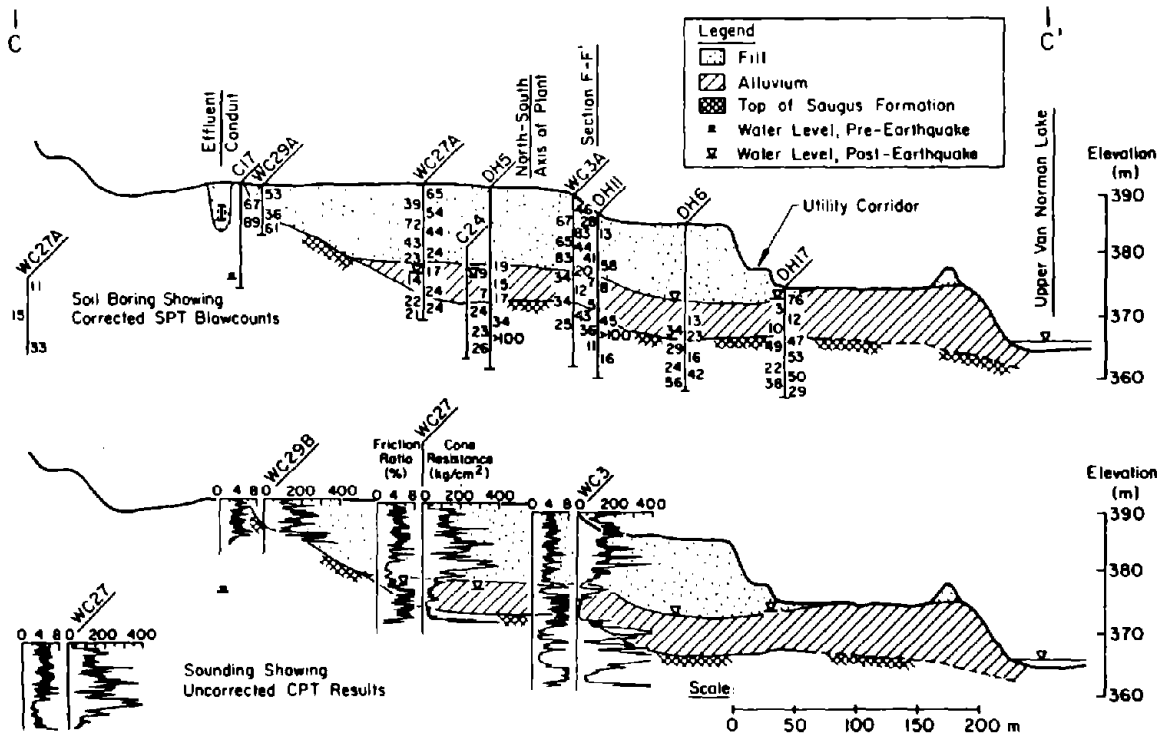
Soil Profile at Cross-Section C-C', Joseph Jensen Filtration Plant
